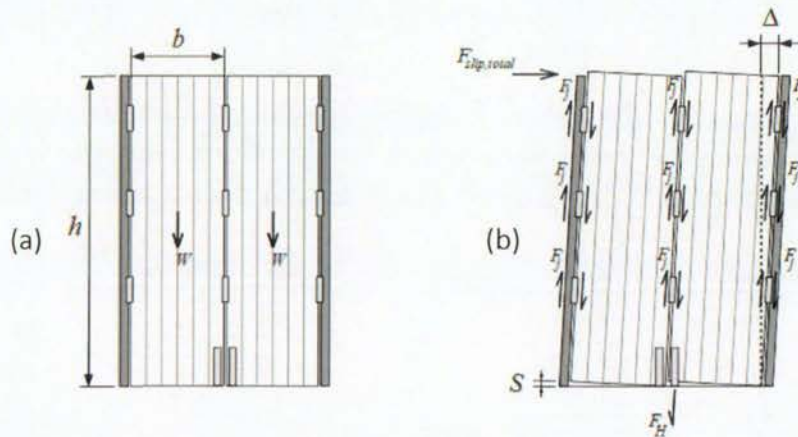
Coupled CLT walls with RSF joints: a) Before Rocking b) After Rocking (Note: Outside columns are restrained from any uplift)
